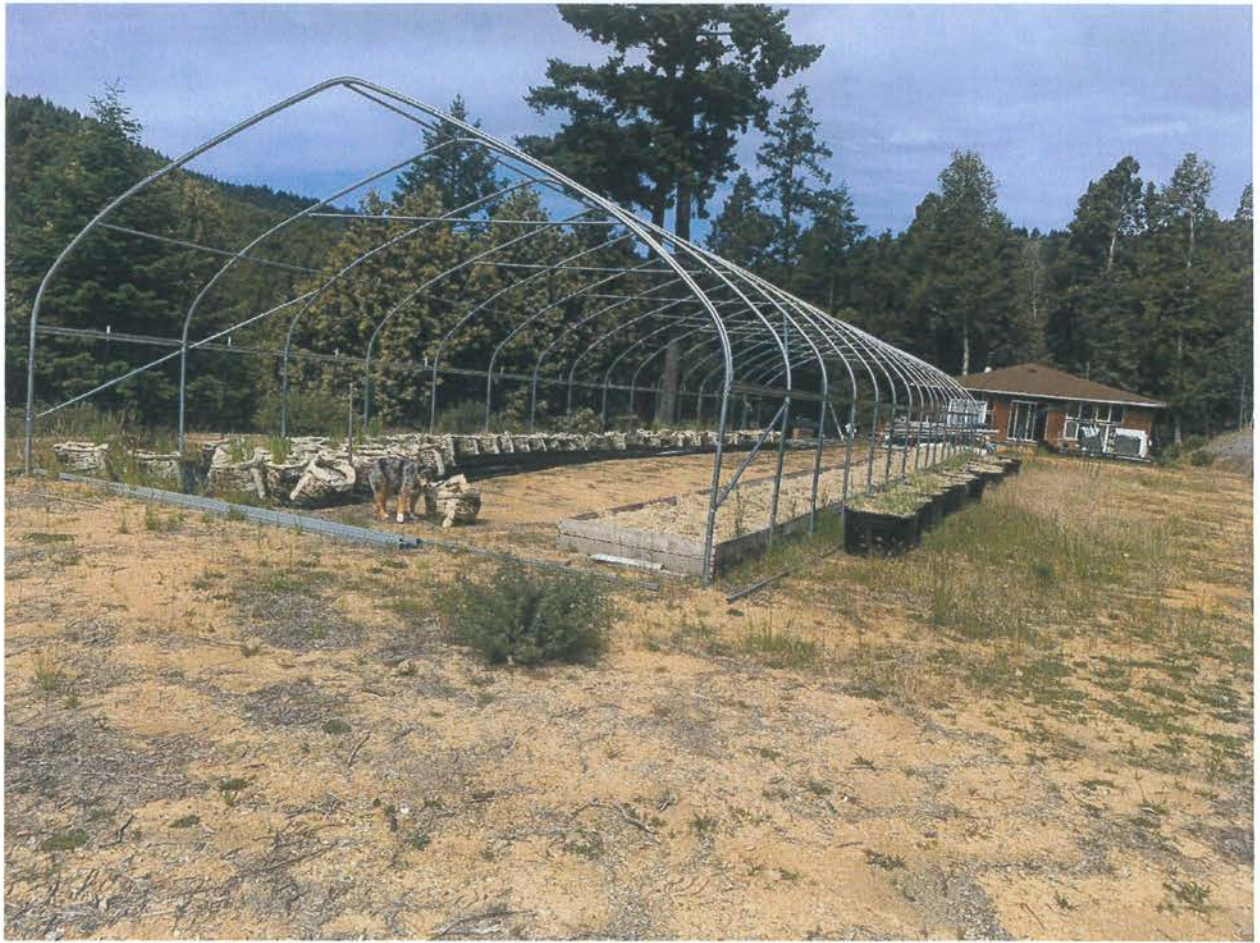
Cultivation Site looking southeasterly. Note reconstructed fill slope on left edge of photo. Photo date 6-5-2020.
